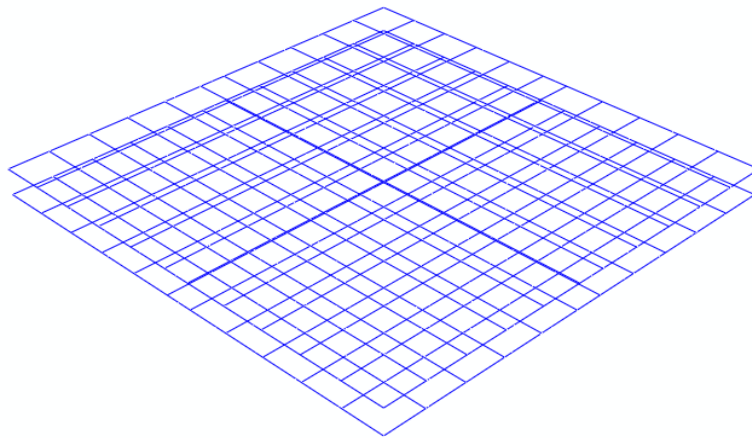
Typical tension and compression reinforcement for A-1a, A-7b and A-7 slabs
